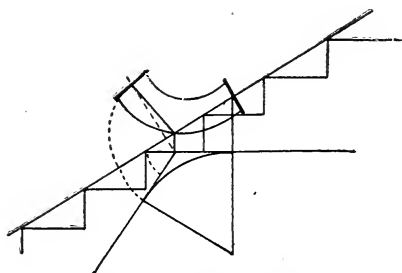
Arrangement of Risers in Obtuse-Angle Plan, Giving Equal Pitch over Tangents and Flights. Face-Mould Developed.
